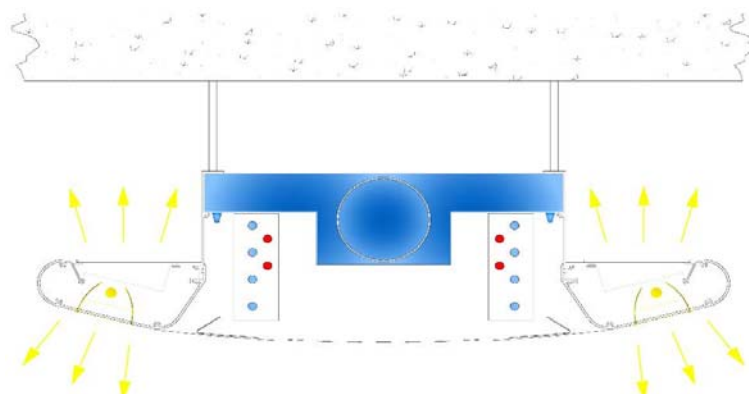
Typical Active MSCB Section View detailing Direct and Indirect Lighting Solution.
